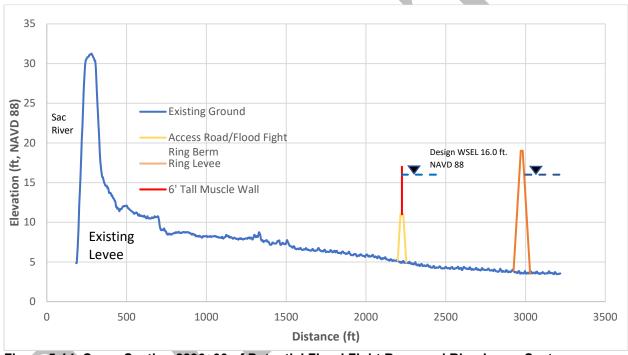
Cross Section 2896+00 of Potential Flood Fight Berm and Ring Levee Systems
